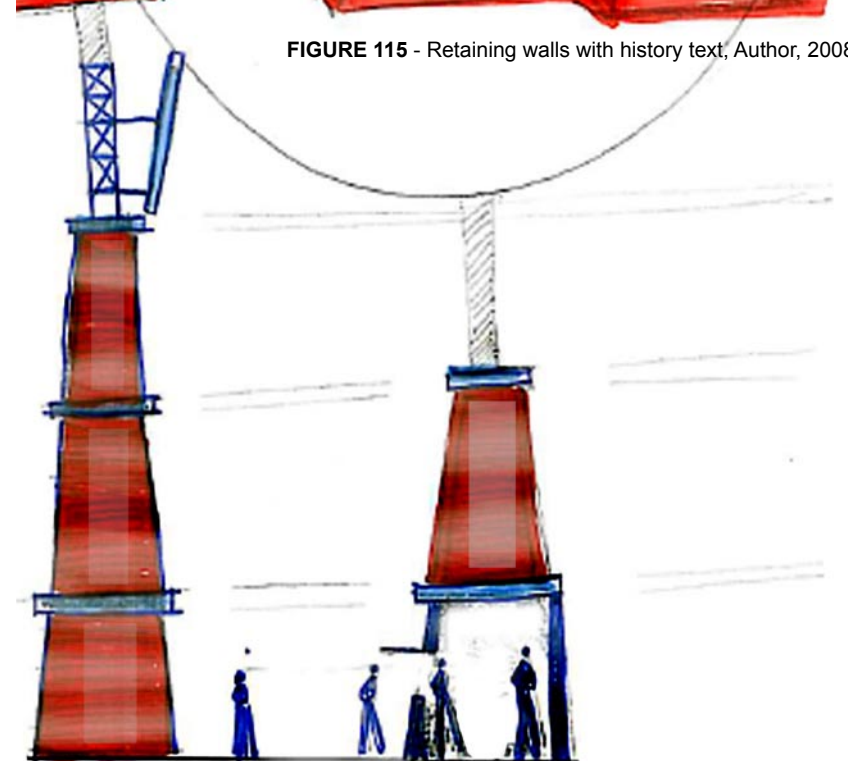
Brick chimneys as floodlight structures and refreshment shop, Author, 2008
